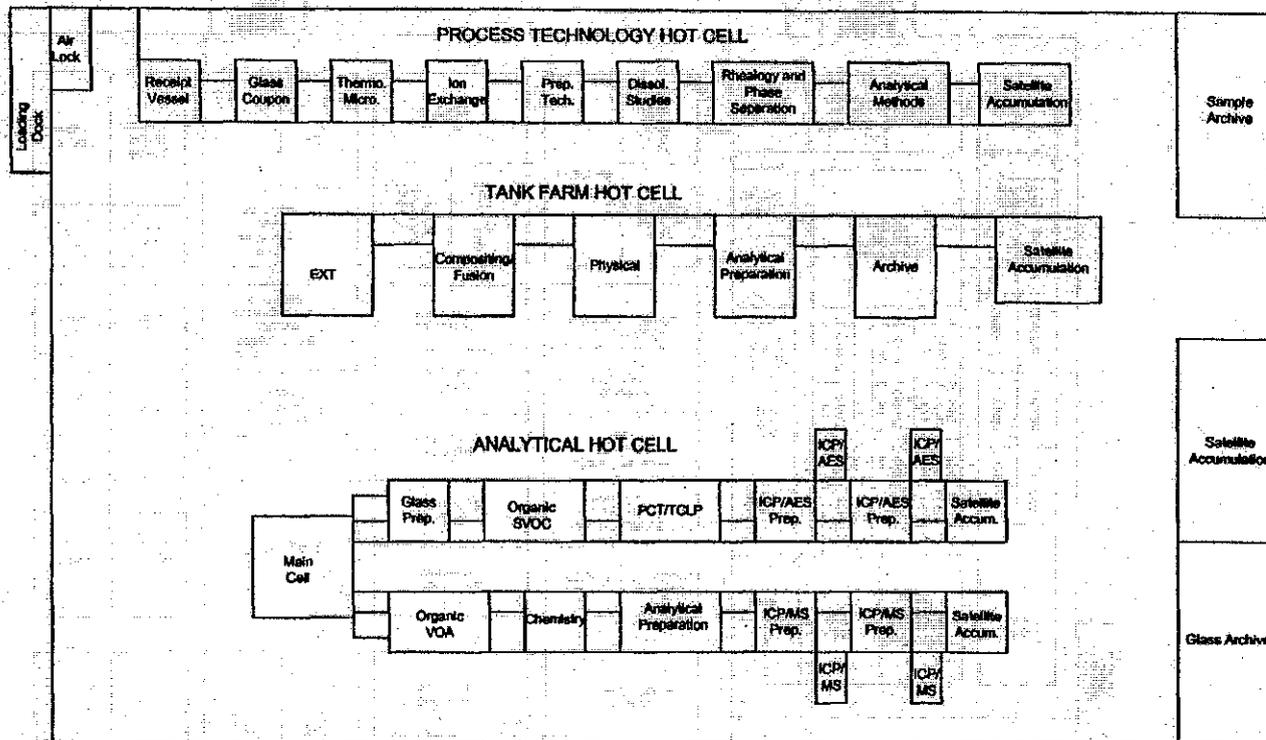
A-108 Analytical Laboratory Second Floor General Arrangement
